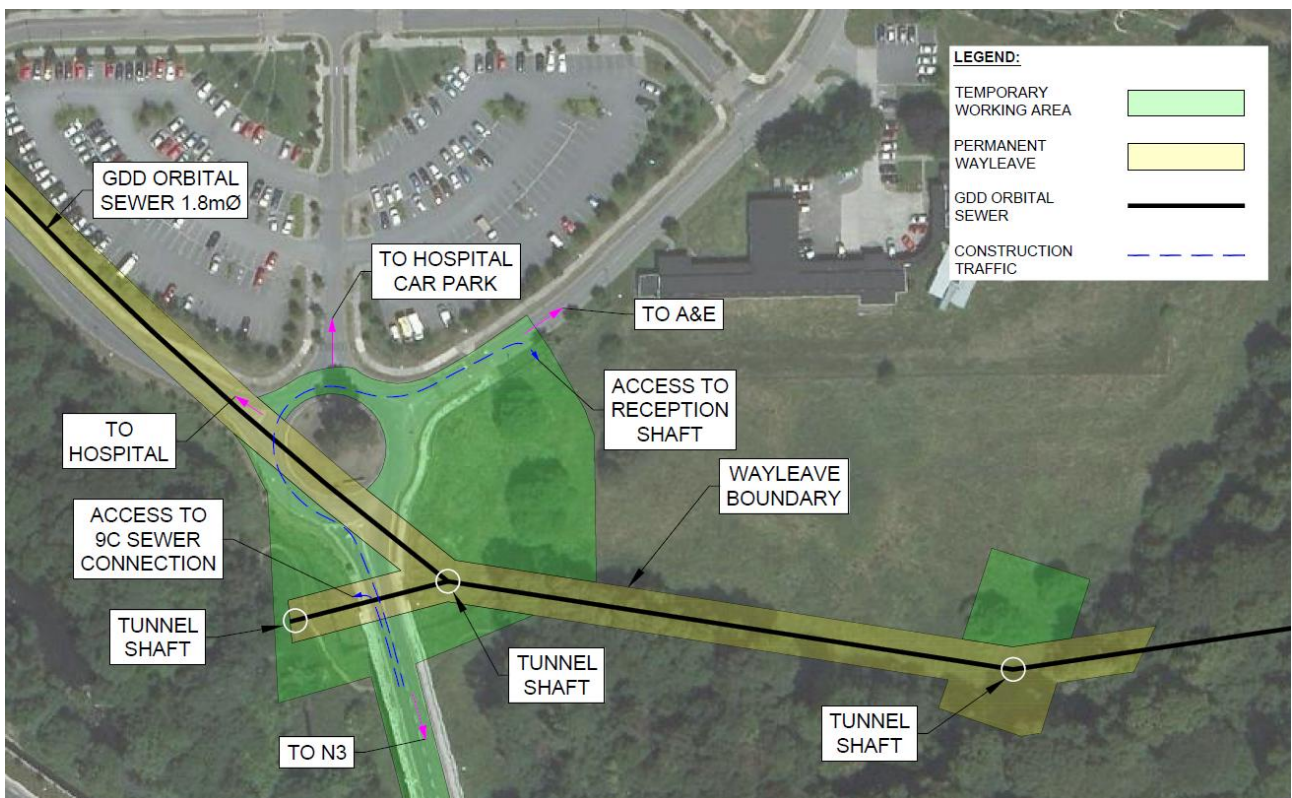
Construction Traffic Temporary Access Points at Connolly Hospital Roundabout
